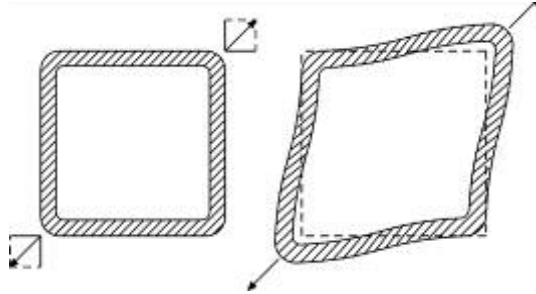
Loading causing distortion of the cross-section (left) and distorted member (right) (Yrjölä 2008).
